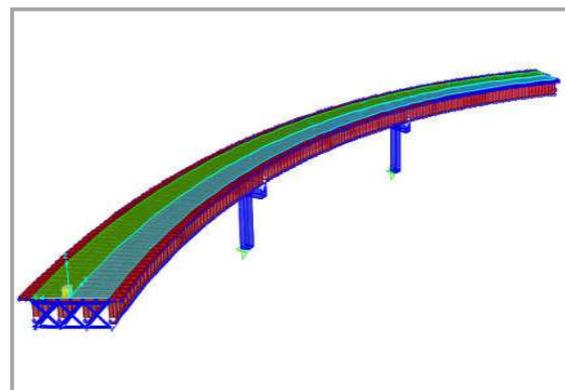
3D finite element model for the 4-girders curved bridge, cross frames and lanes width are shown.
